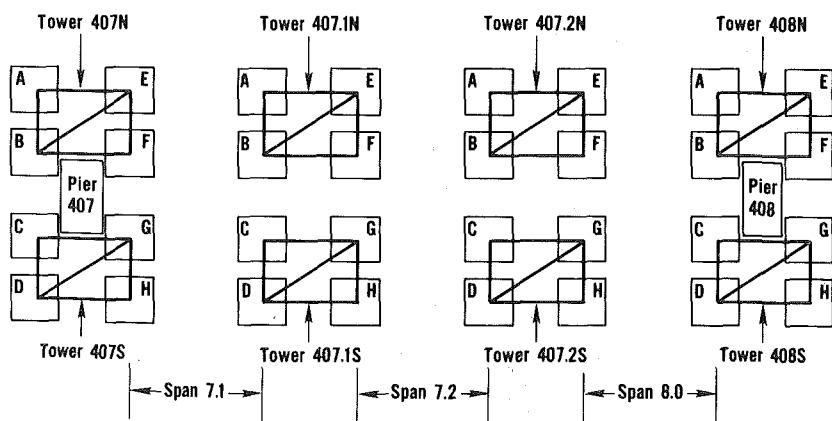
Plan View of Shoring Towers and Supporting Concrete Pads, Indicating Identifying Nomenclature
